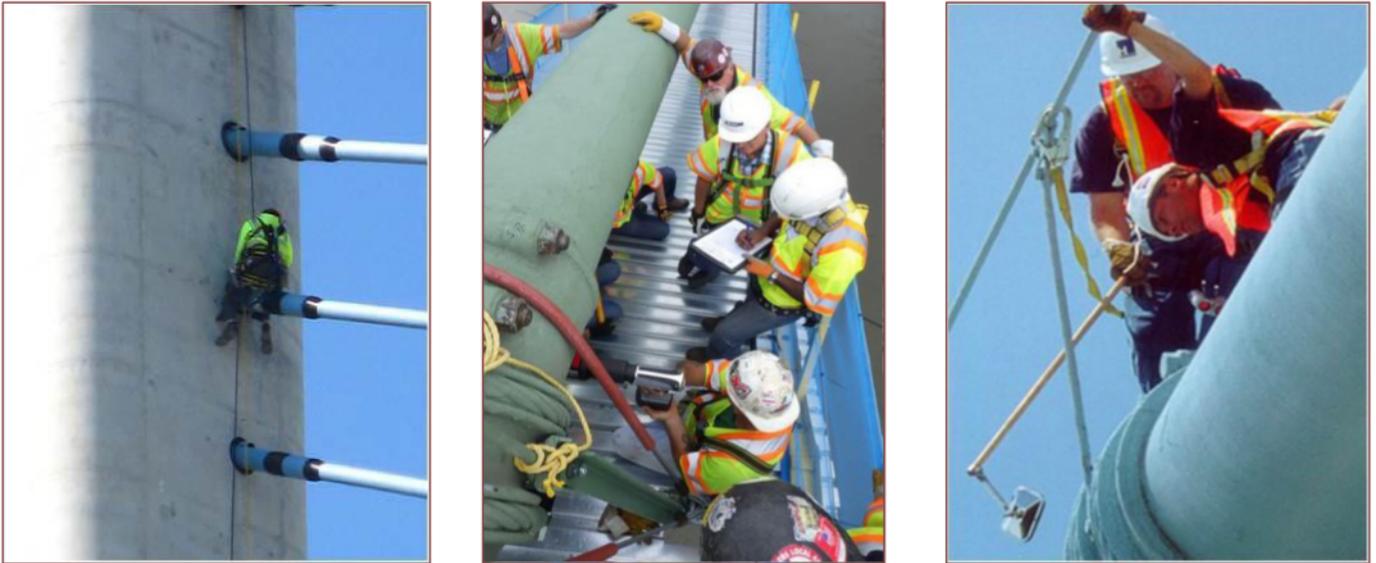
(from the left): Inspecting stays. Checking Cable Band Bolt Tensions. Inspecting cable bands
